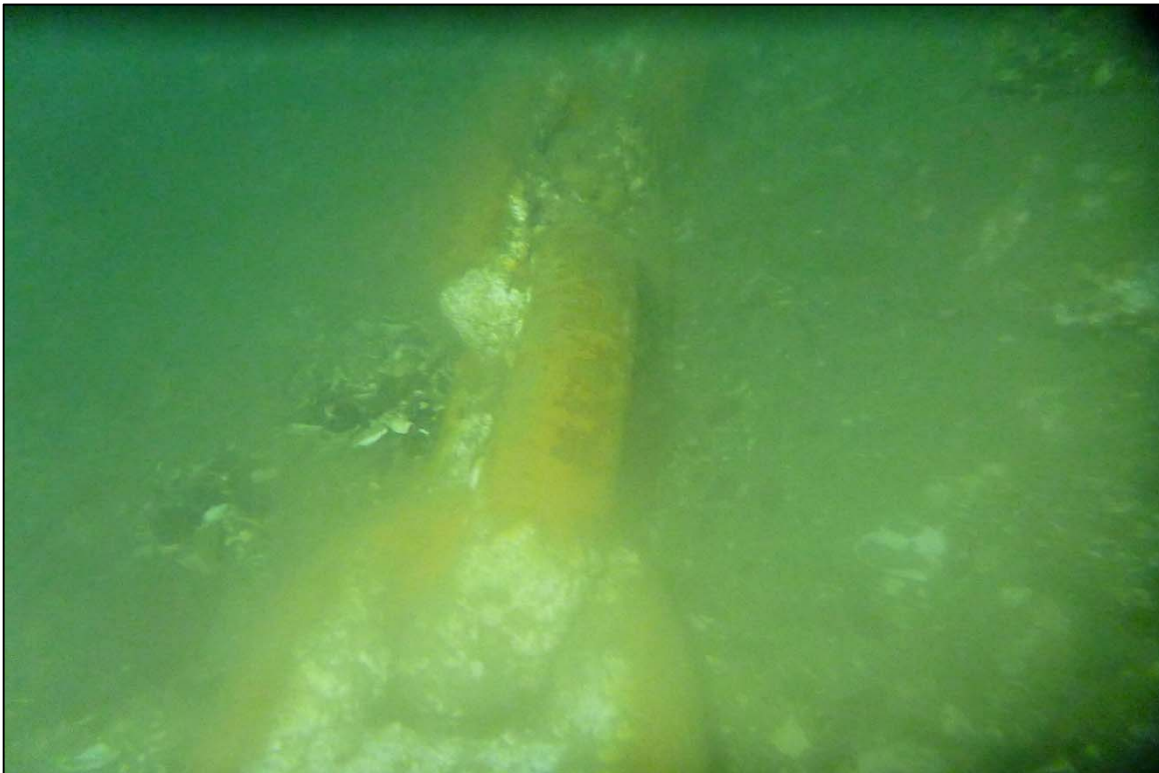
View of Exposed Anchor Stem at Site 3 Anchor Line 19, Looking West.
